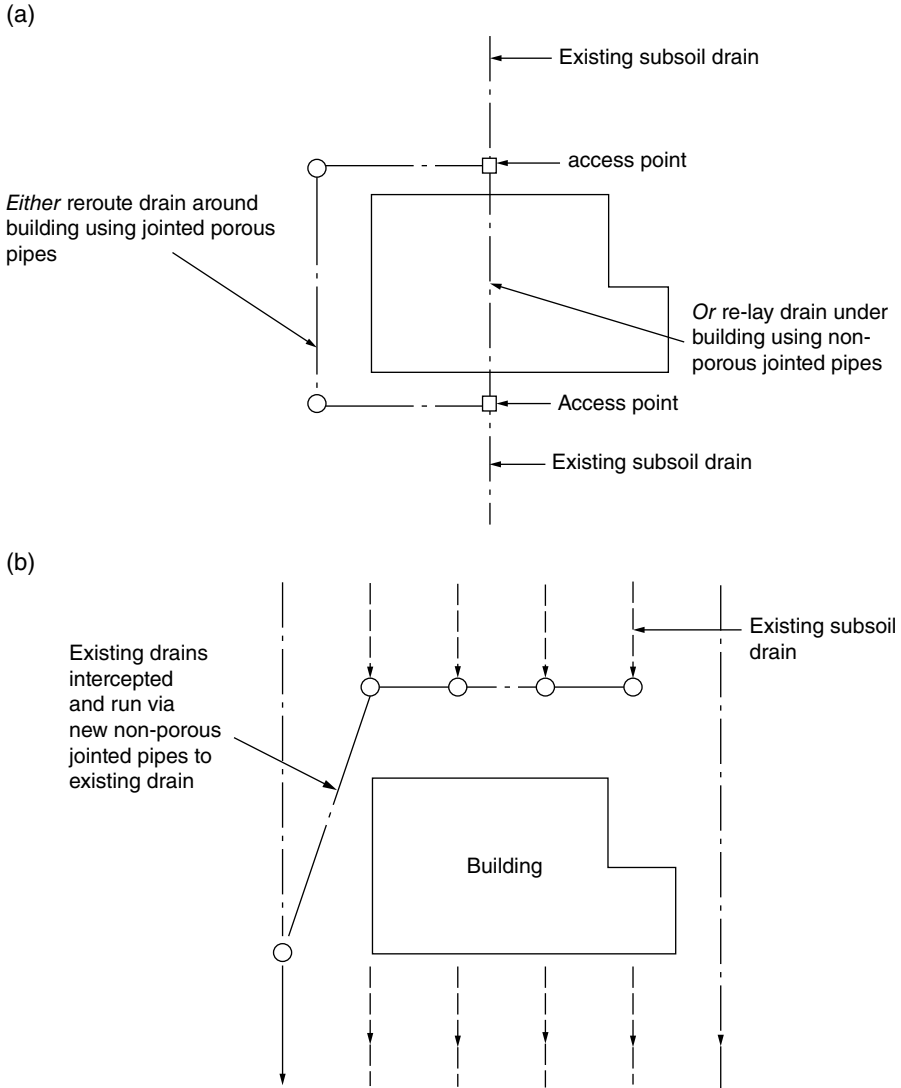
Subsoil drainage. (a) Single subsoil drain. (b) Interception of multiple subsoil drains.
